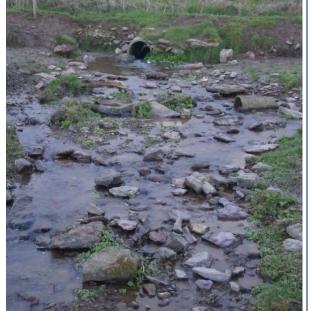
Upstream View of Shannon Park Cross Tributary with Existing Culvert (Site 7).
